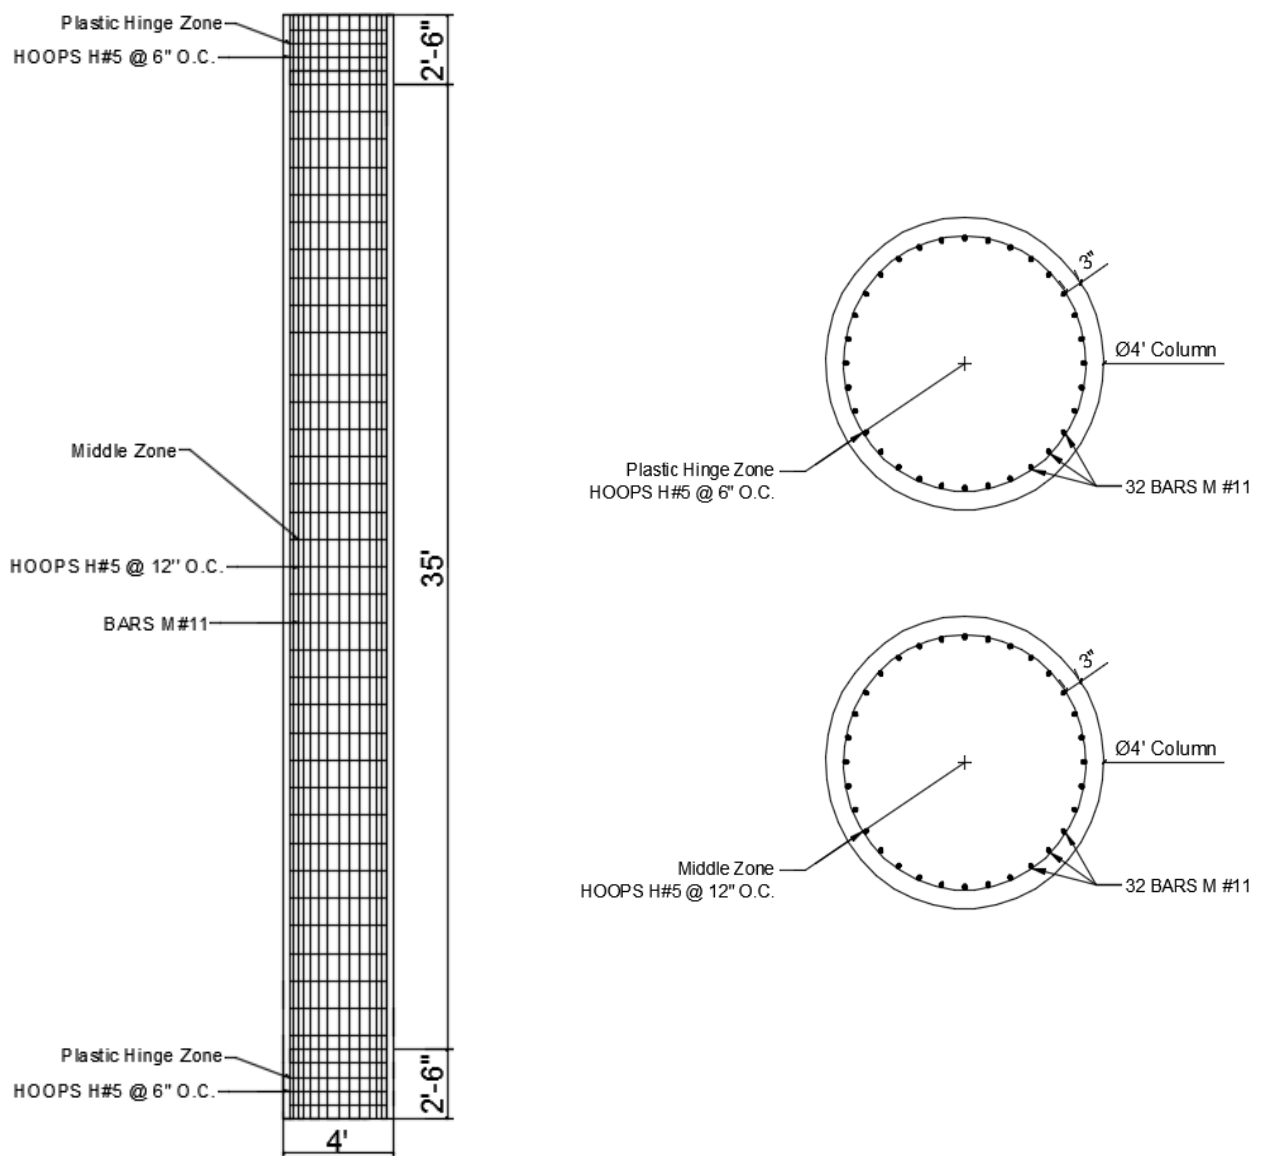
Dimensions and Reinforcement Details of Example Column
